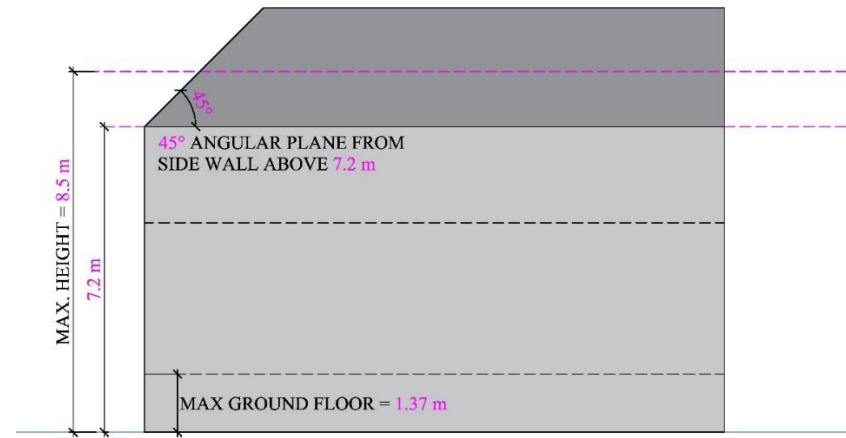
K.F8: Perpendicular Massing on Pitched Roof Building with No Front Porch
